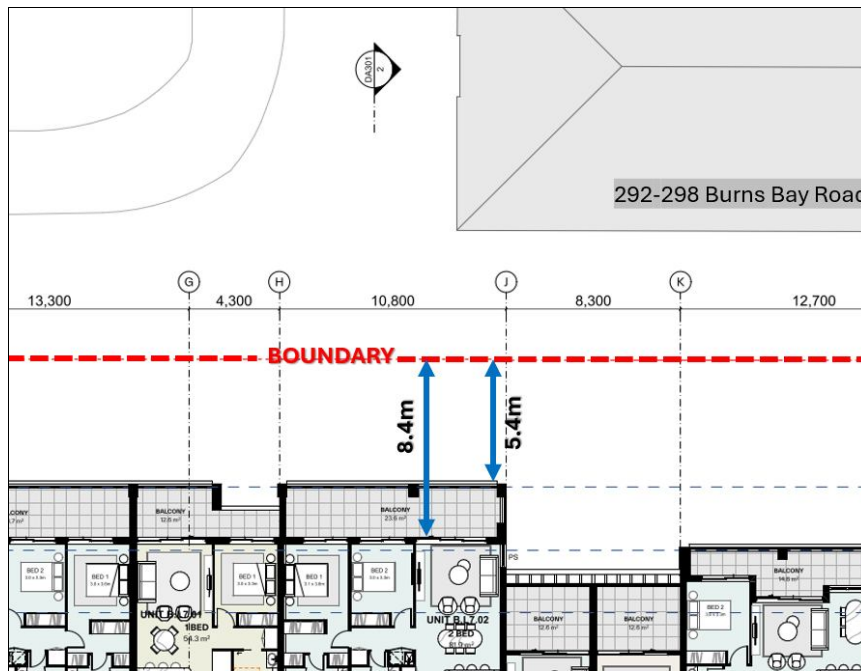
Excerpt of Level 7 Plan. Non-compliant building separation of Building B. (Source: pbd architects)
